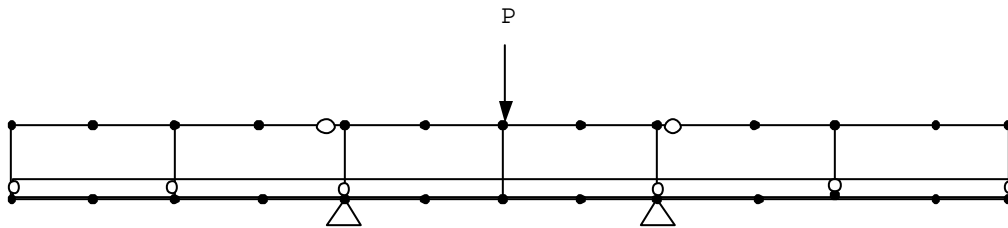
Illustration of 3-Span Bridge Chord, Rods are Hinge Elements, 1-Point Load Beam Model
